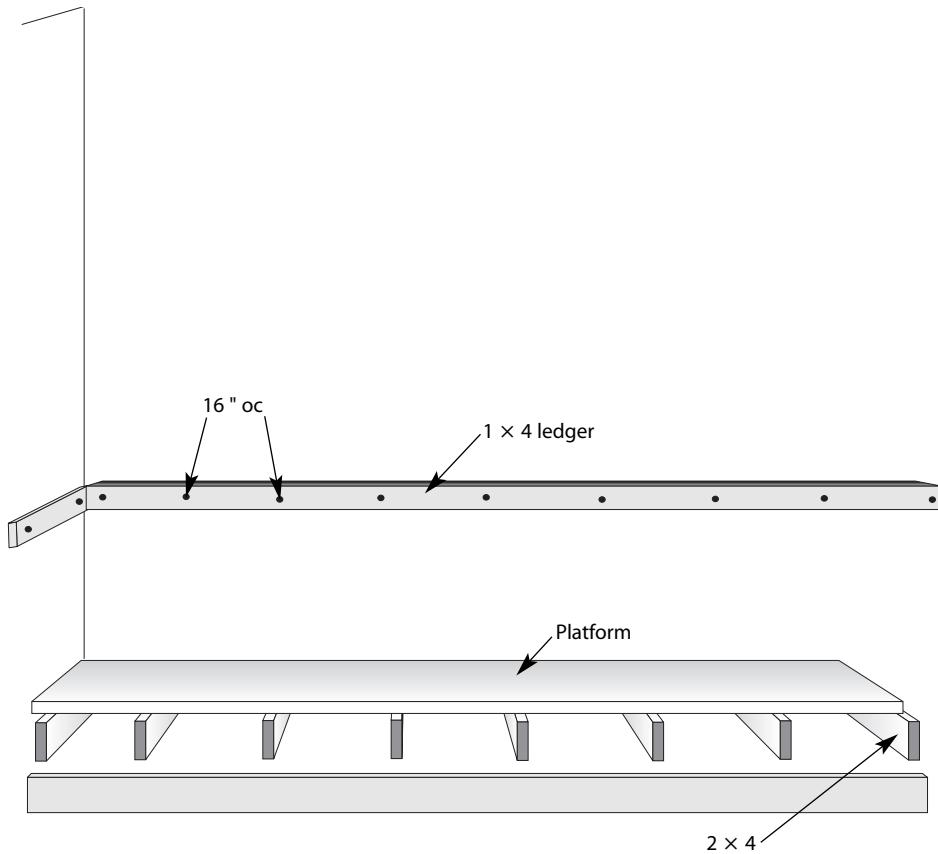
is an illustration of a site-built cabinet. Site-built cabinetry is built in place and attached to the walls and floor. Here are the basic components of a cabinet.
